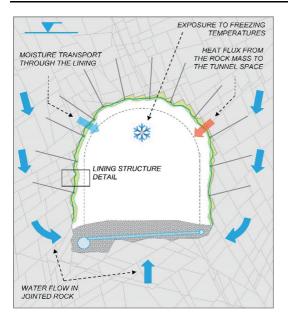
Main elements in the conceptual model for a tunnel with permanent SCL based on fiber-reinforced sprayed concrete, sprayed waterproofing membrane and rock bolts constructed in hard rock. Detail is shown in Fig. 2
